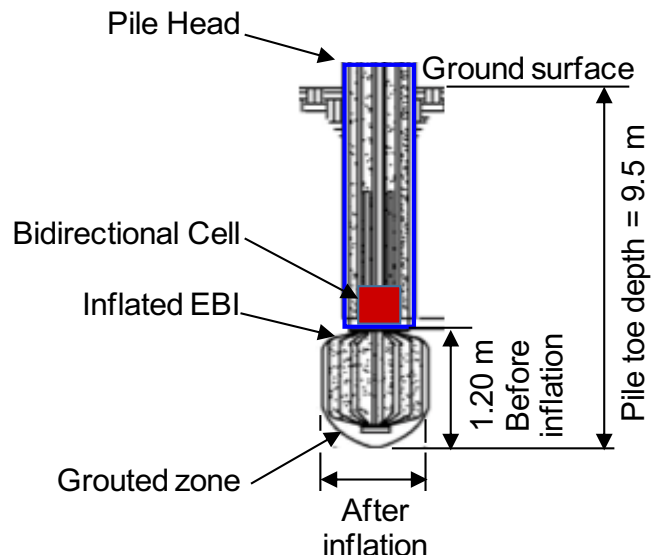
Sketch showing the EB and BD arrangement (not to scale).
